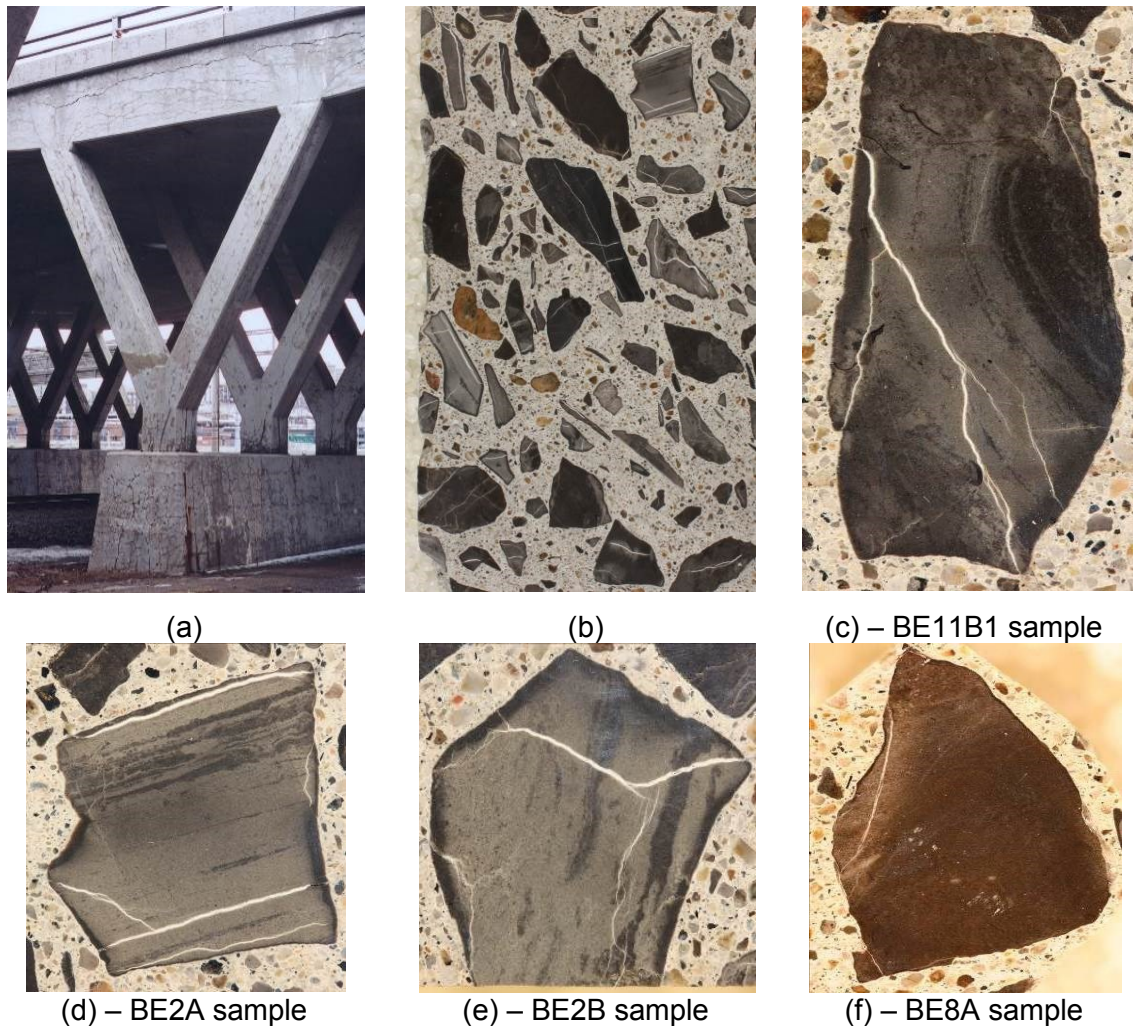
(a) ASR-affected concrete structure in the Québec City area; it is composed of Y-shaped columns sitting on massive foundation blocks and supporting a bridge deck with no shear reinforcement. Cores were extracted from the massive foundation blocks; (b) Plane polished section of a concrete core extracted from the foundation blocks; (c) Selected BE11B1 particle with both light-grey and dark-grey zones for microprobe analysis; (d) Selected BE2A particle for microscratch testing; (e) Selected BE2B particle for microscratch testing; (f) Selected BE8A particle for microscratch testing.
